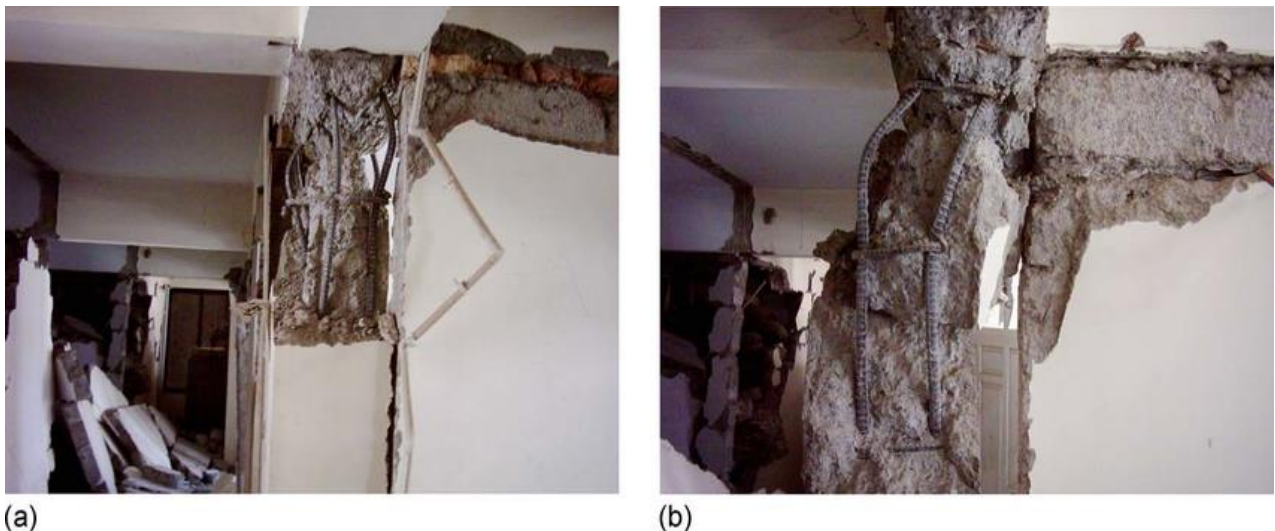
Flexural collapse on a column with the development of a plastic hinge.
